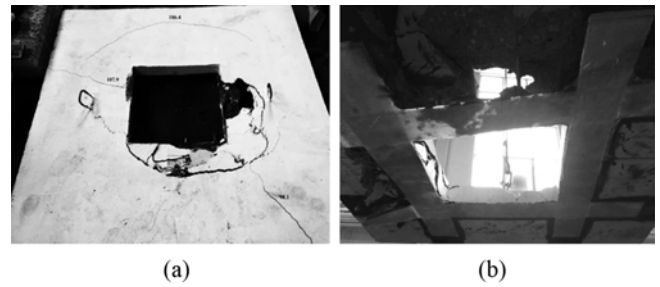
The Failure Mode and Cracking Pattern for Slab SOGC2: (a) Compression Side, (b) Tension Side
